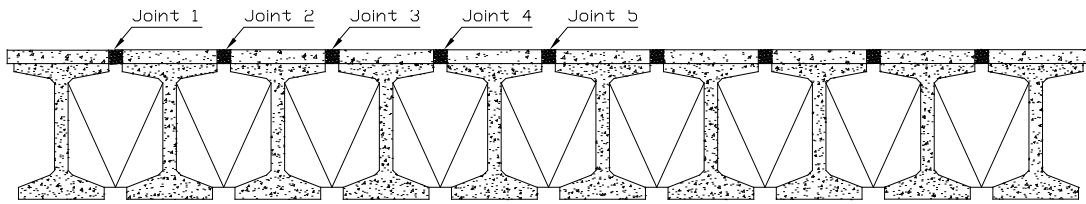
Cross Section of Optimized Decked Bulb Tee Girder
